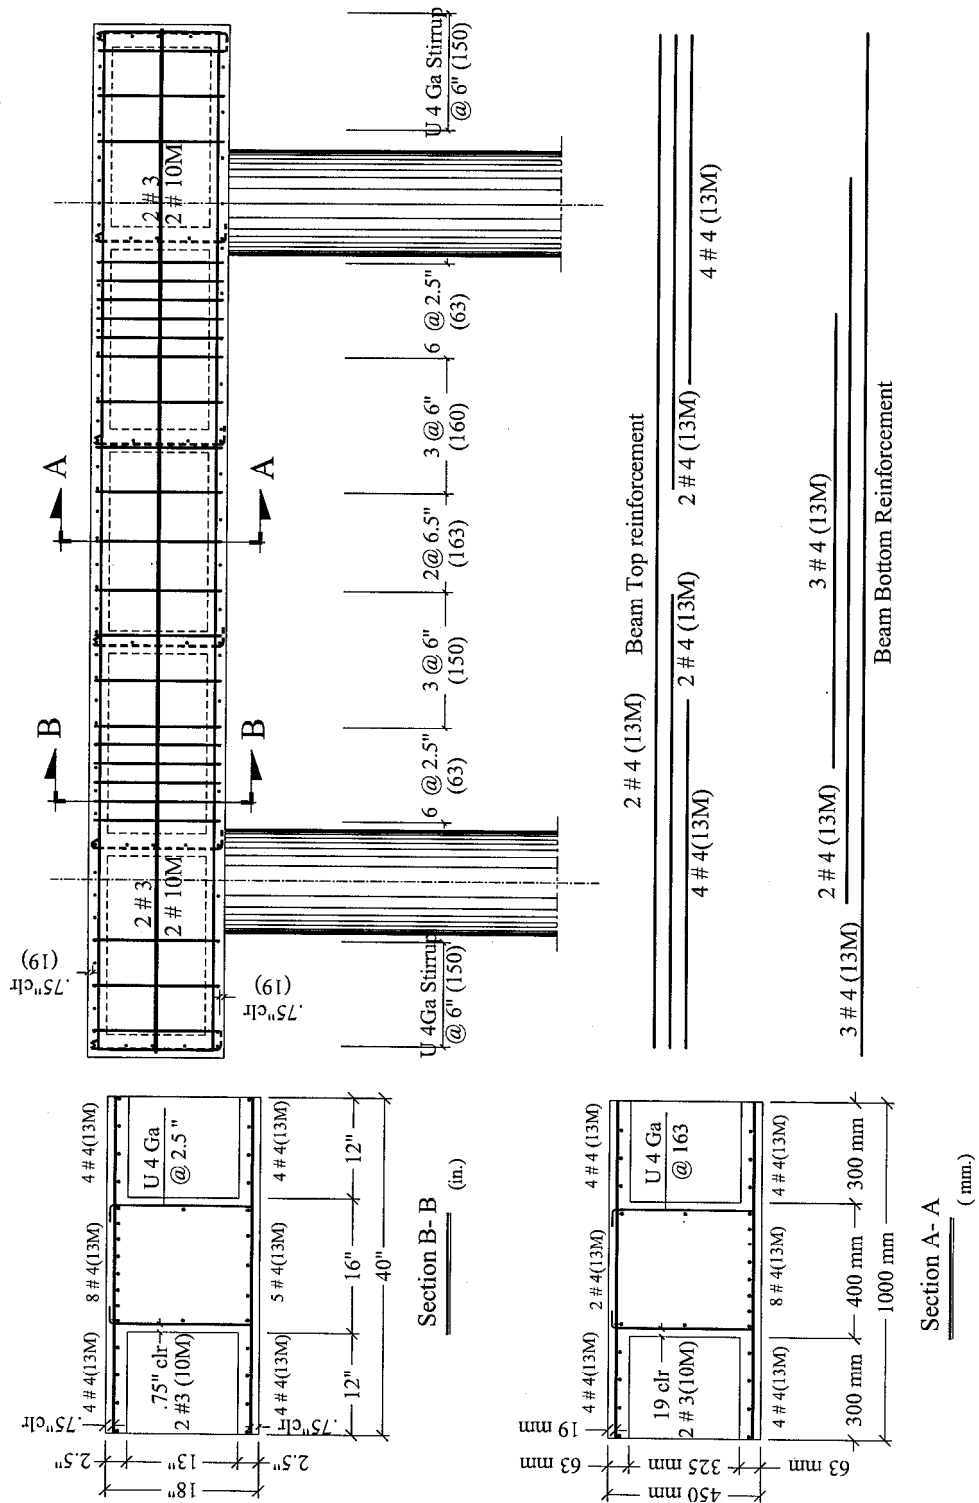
Details of Beam Reinforcement of As-Built Specimen (SI & English Units)
